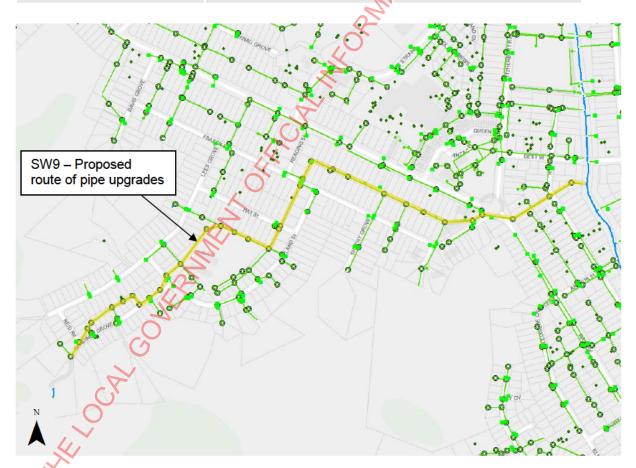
Location of Lees/Fraser Street stormwater pipe upgrades
